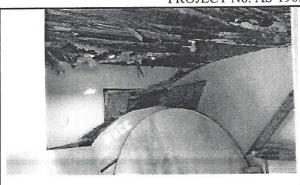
HA1 9x9 Floor Tiles *Assumed Positive, Approx. 787 sq ft*±
